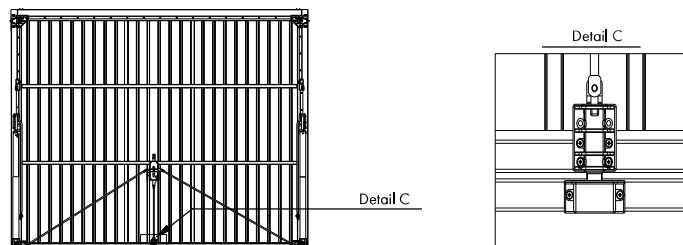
Up and over door bolted to the threshold with a self-locking latch.
